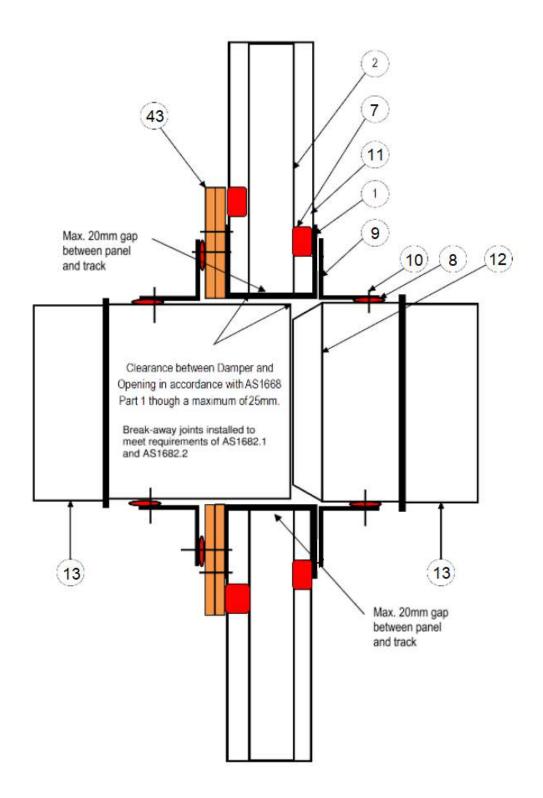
A – Damper installation General with Fire grade plasterboard installed on the occupancy side between damper flange and speedpanel wall
